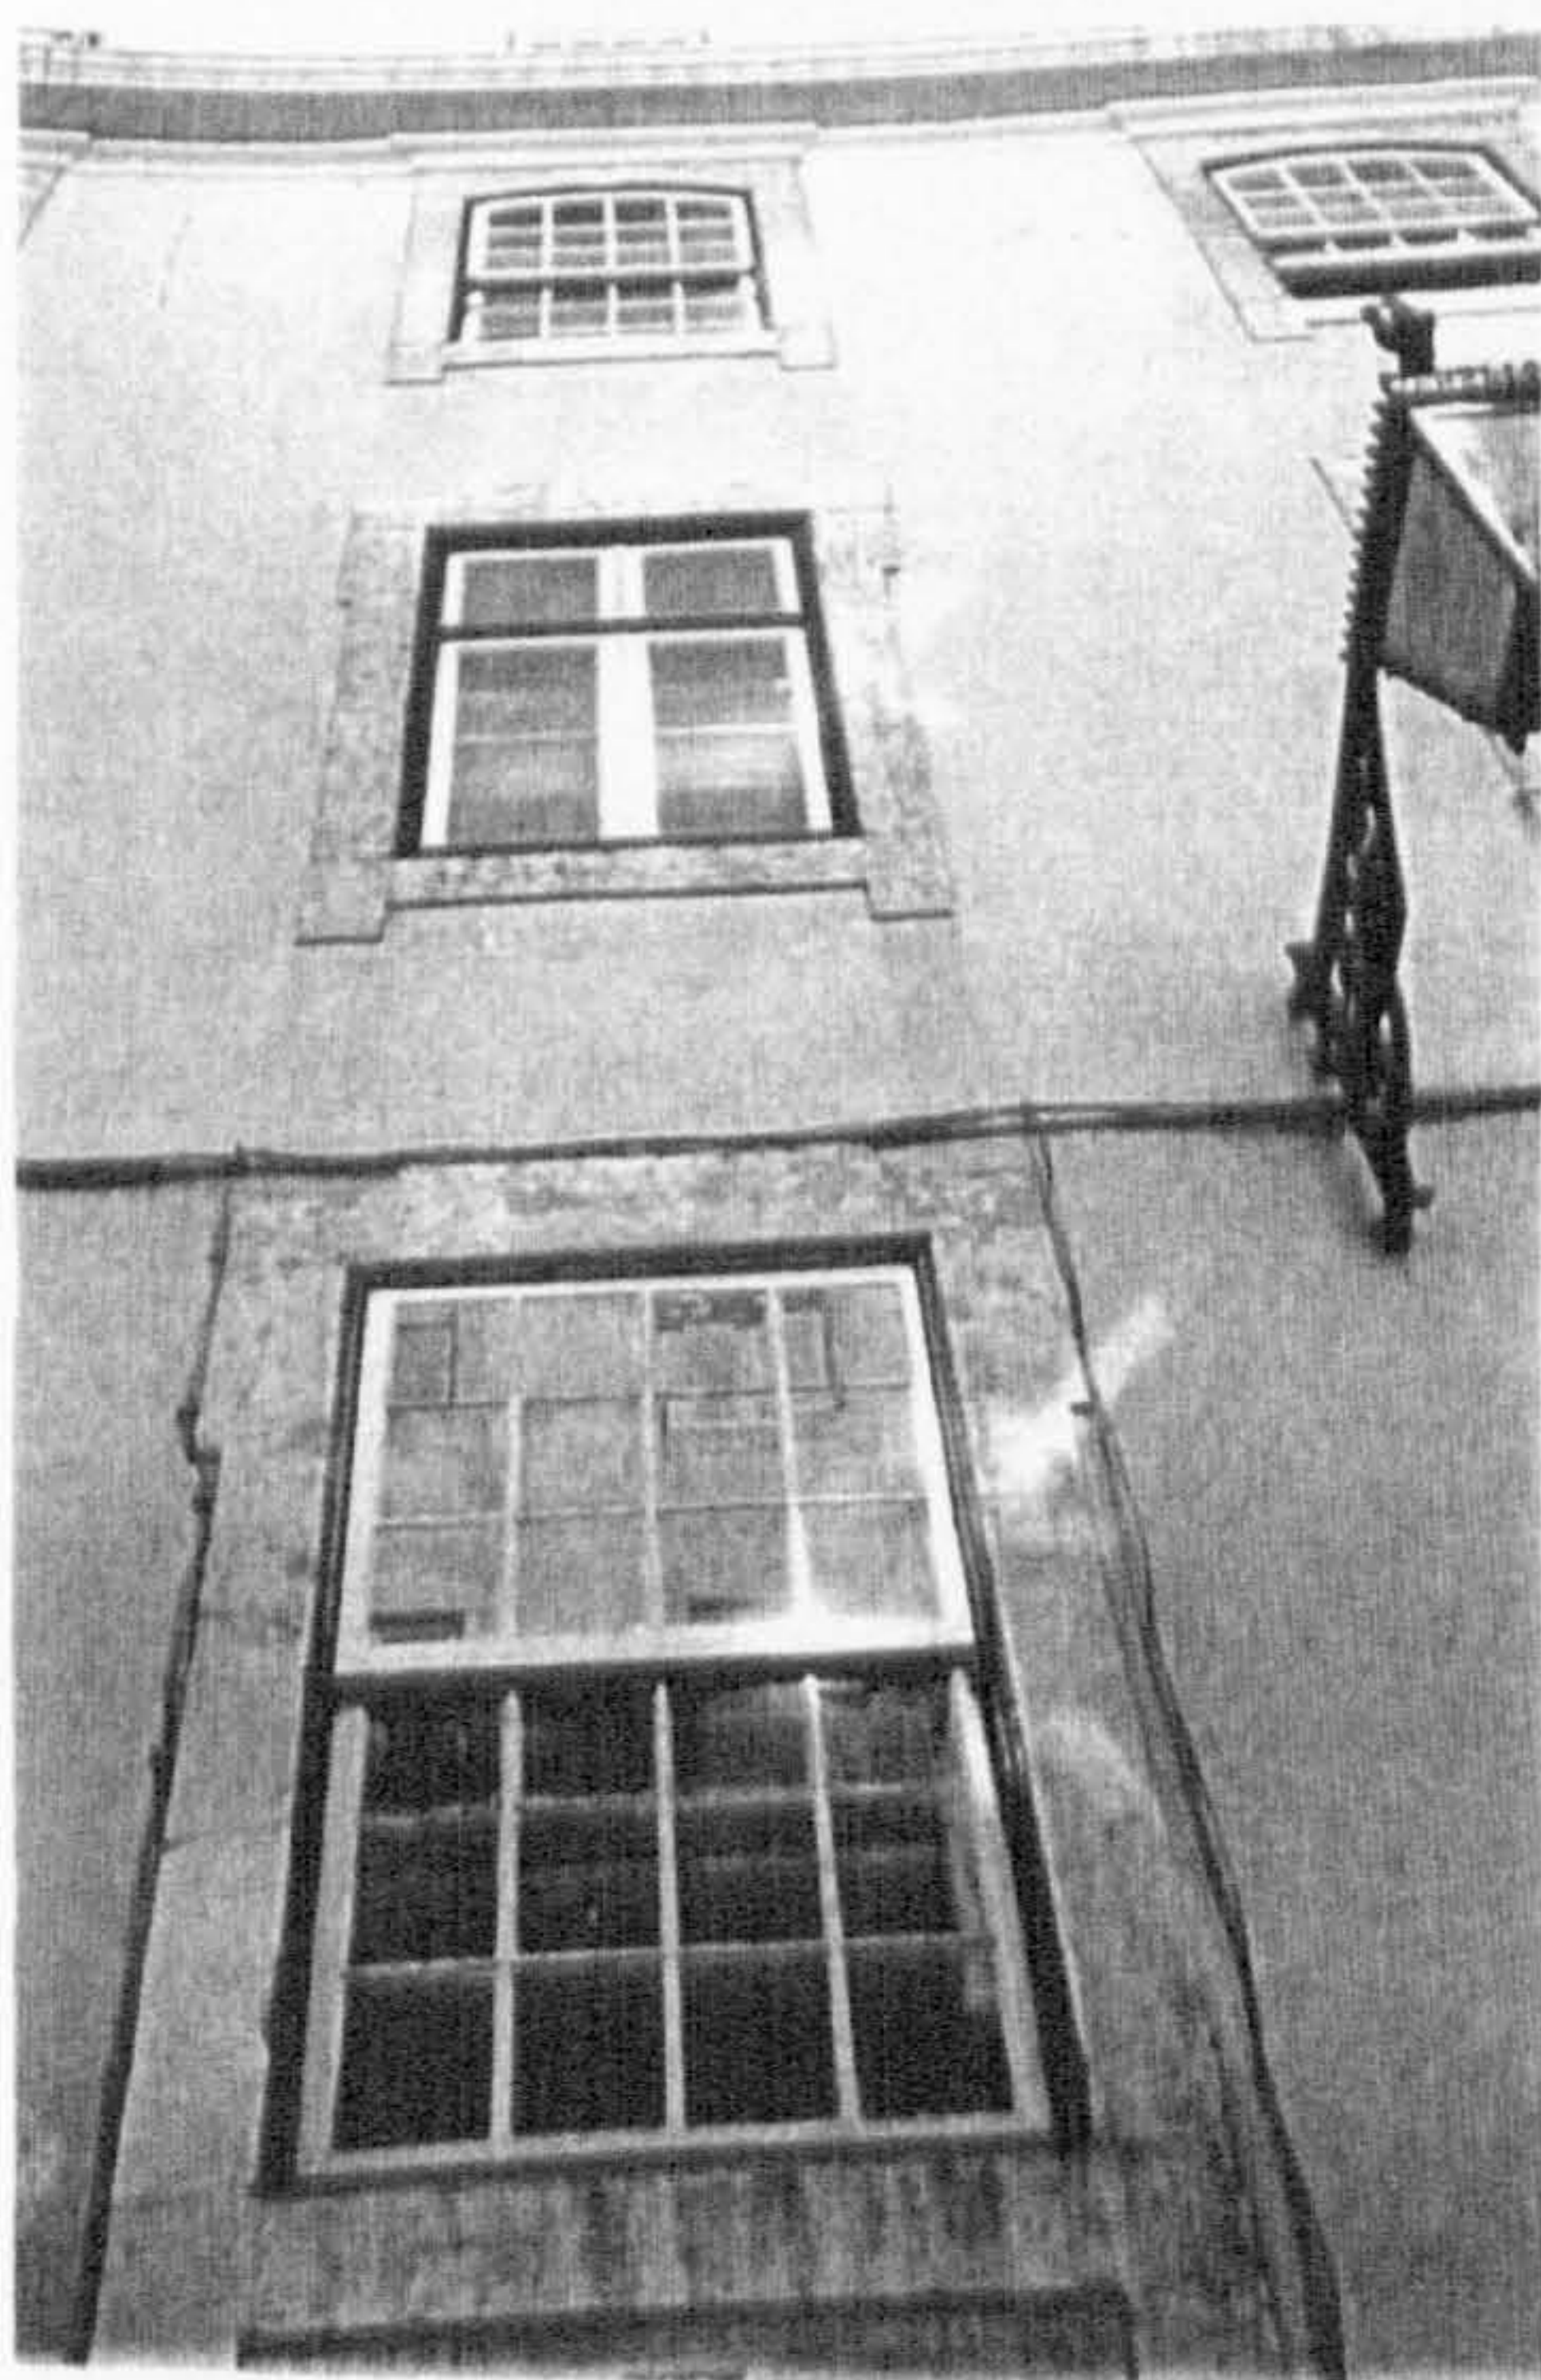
Pilaster used to cover junction between buildings, Prata Street.
